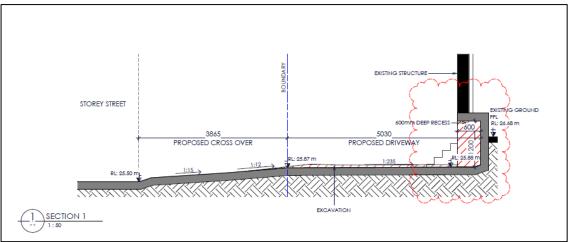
Plan showing existing ground line, proposed cut and existing ground floor level of dwelling (Drawing DA-05.10 Rev 3 prepared by Pinnacle Design Studio)
